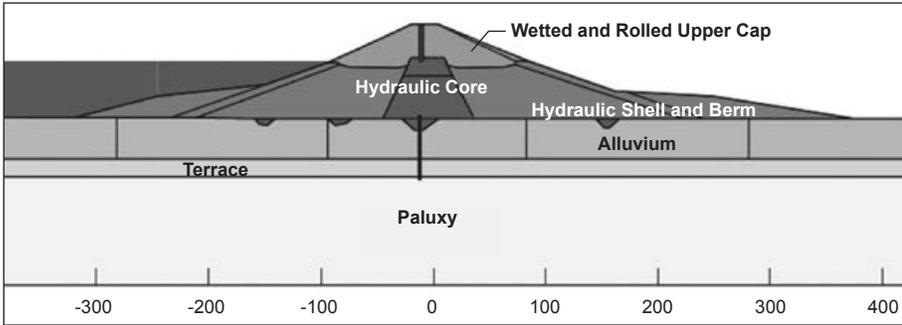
Preliminary Model of Main Dam Hydraulic Fill Cross Section
